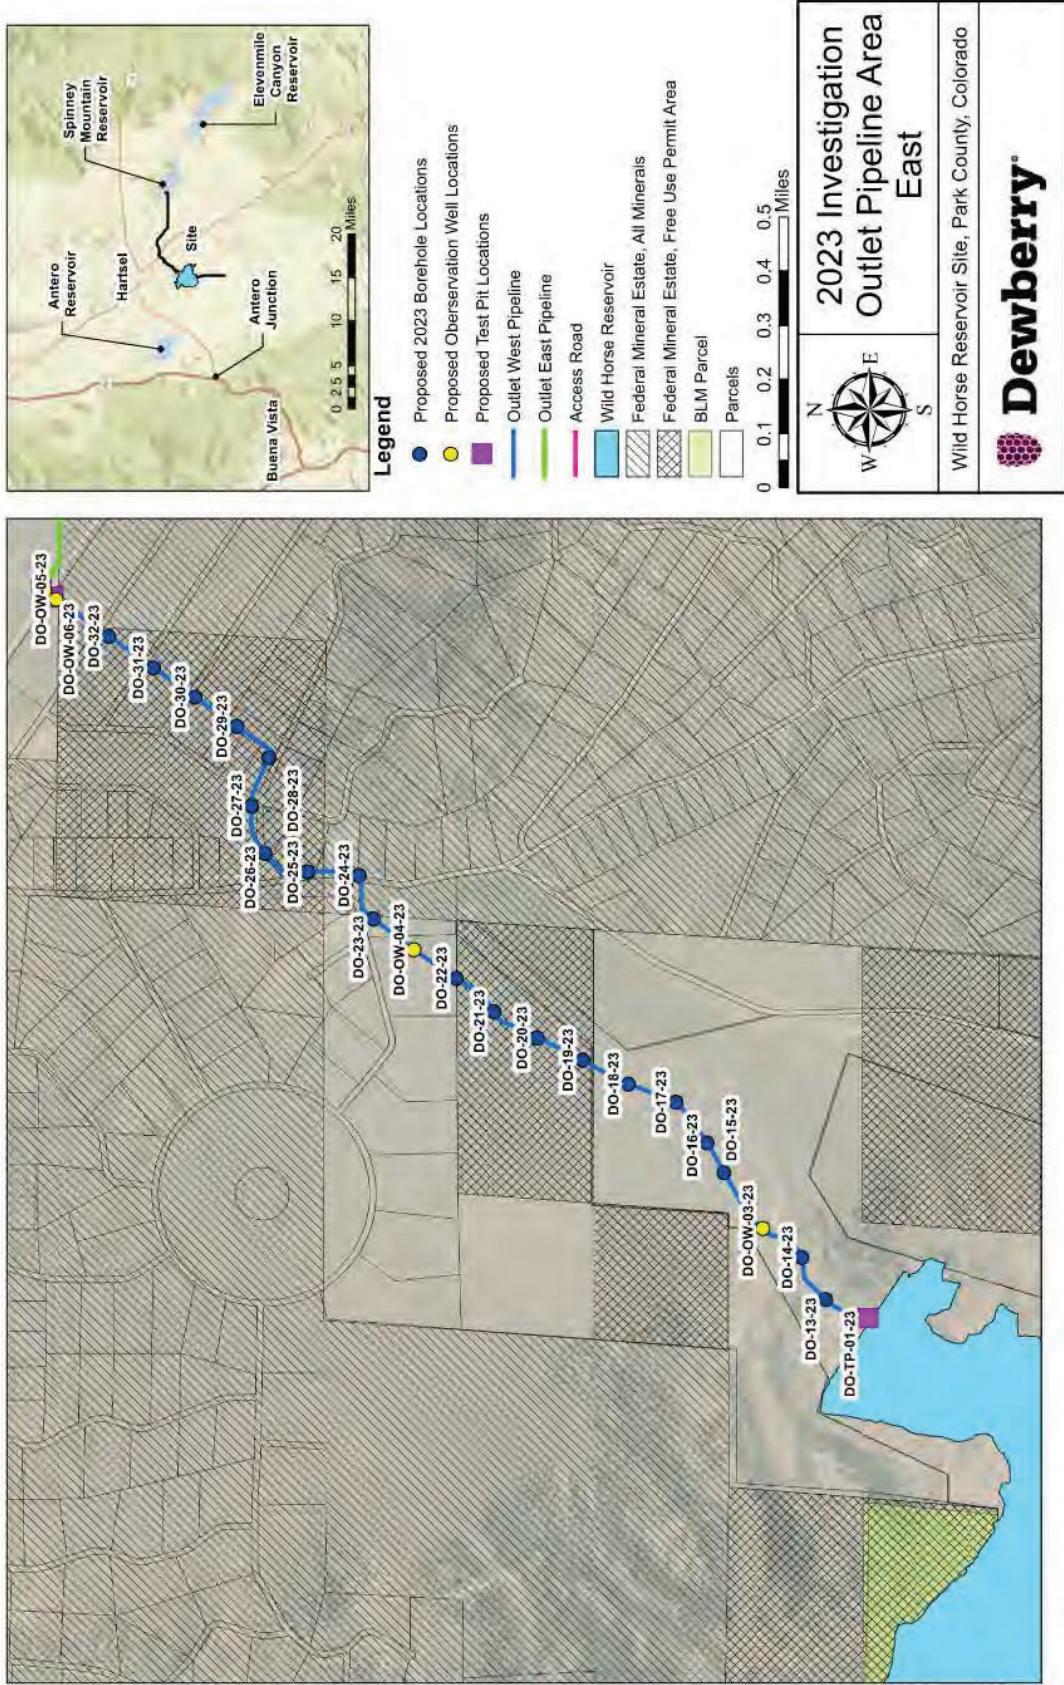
Proposed field investigation plan view of Outlet Pipeline east area
